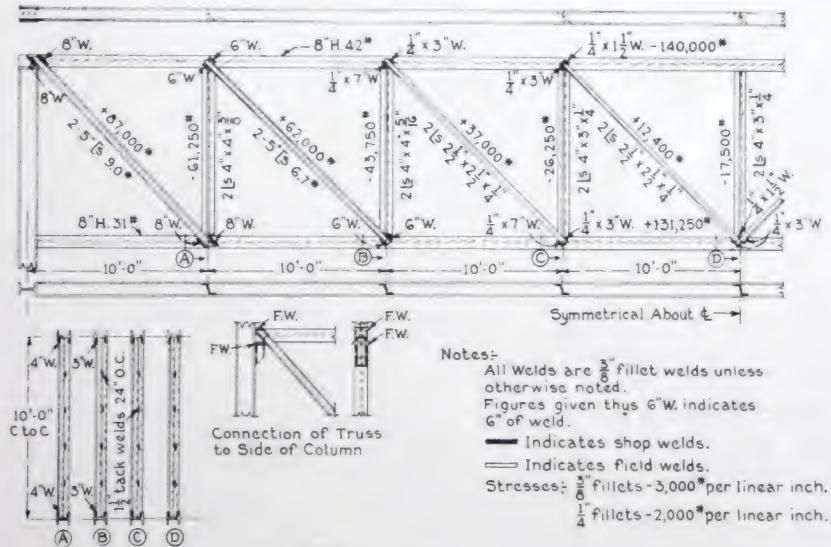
Details of a Typical Arc-welded Truss
